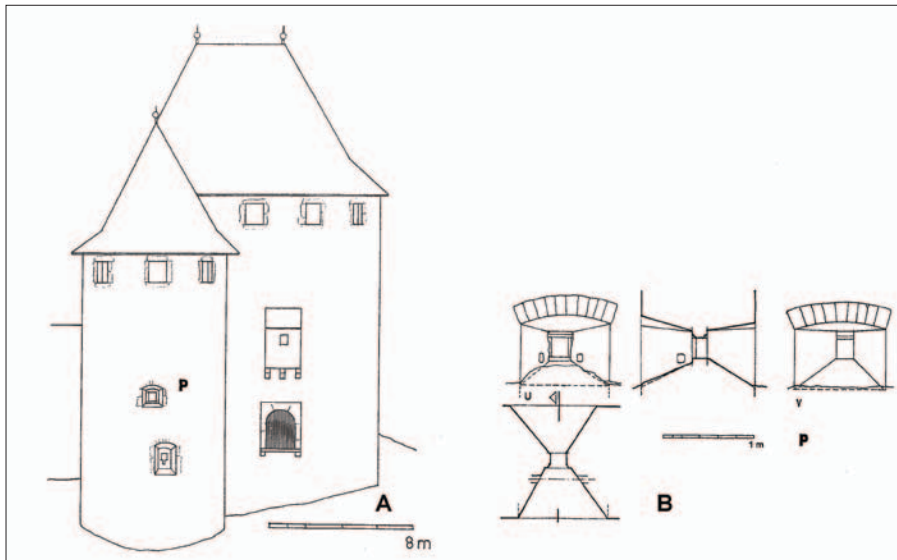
Zelingrad castle: A – twin gatehouses (around 1535); B – gun loop with a rectangular opening (drawing by: Z. Horvat)
